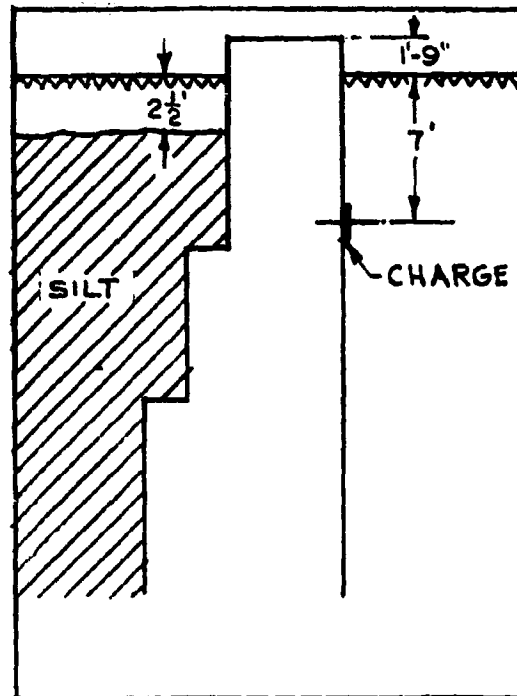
Forty-pound charge 7 feet under water failed to breach wall. Note that charge was opposite point where wall widened to 7 feet.
